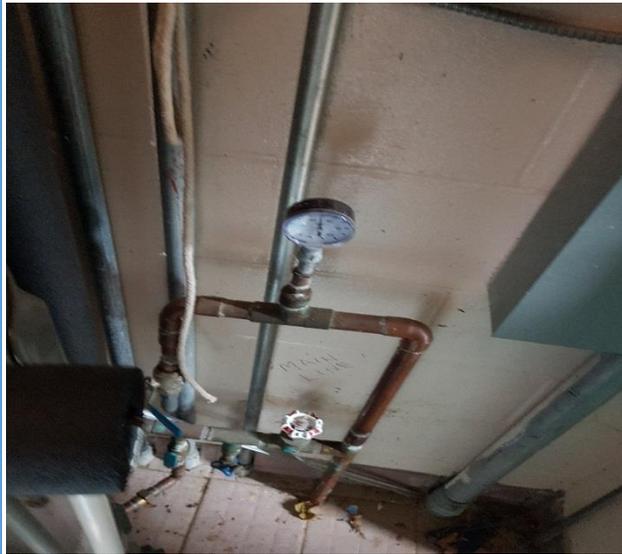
View of copper piping in the Janitor's Closet in the Washroom Building. Lead-containing solder is presumed to be present.
